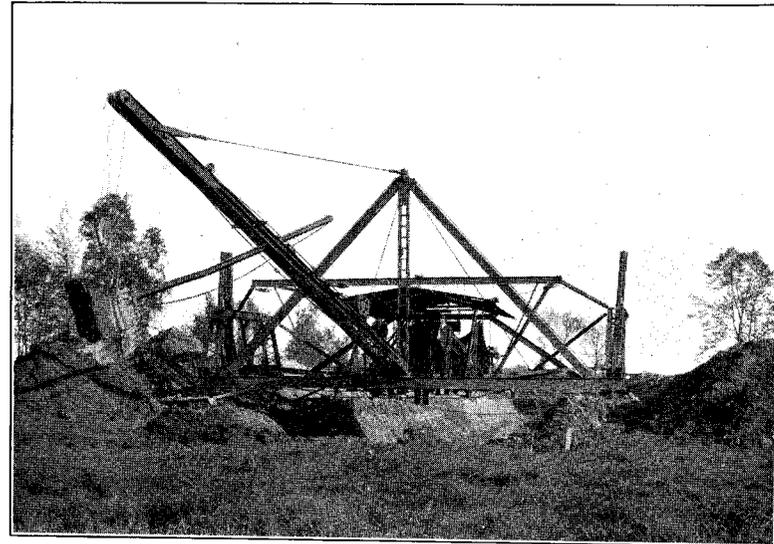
LAND TYPE OF DREDGE CONSTRUCTING OPEN DITCH TEN FEET
